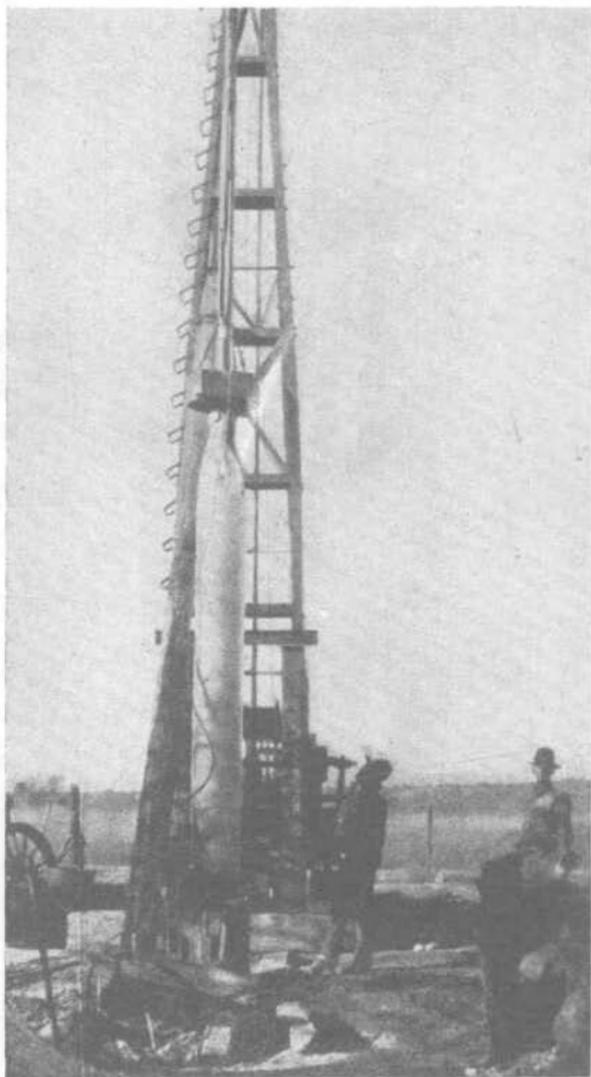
A complete string of tools used in drilling an 18-inch hole, consisting of a clevis or jaw cable socket, sub, jars, sub, and 16-inch mud-scow. The heavy casing cap is suspended from the jars by a short cable as the mud-scow is so large that it will not go up through the hole in the cap.
